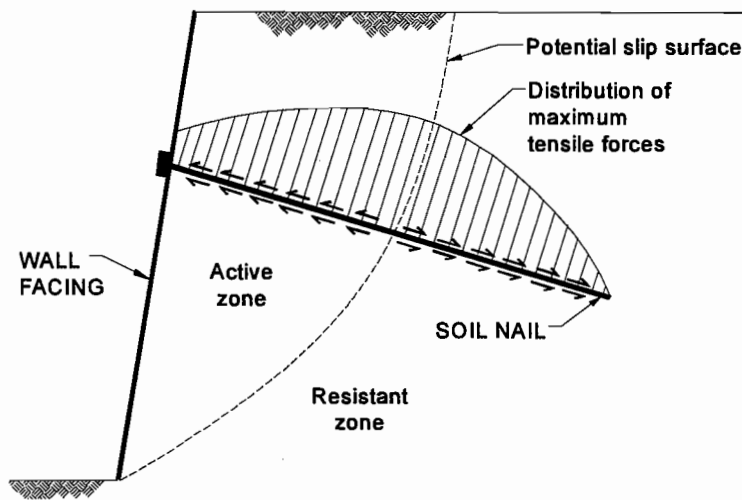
Load transfer mechanism in soil nails (modified after Foundation Engineering Handbook, Chapter 26, 1991. Reprinted by permission of Chapman and Hall).
